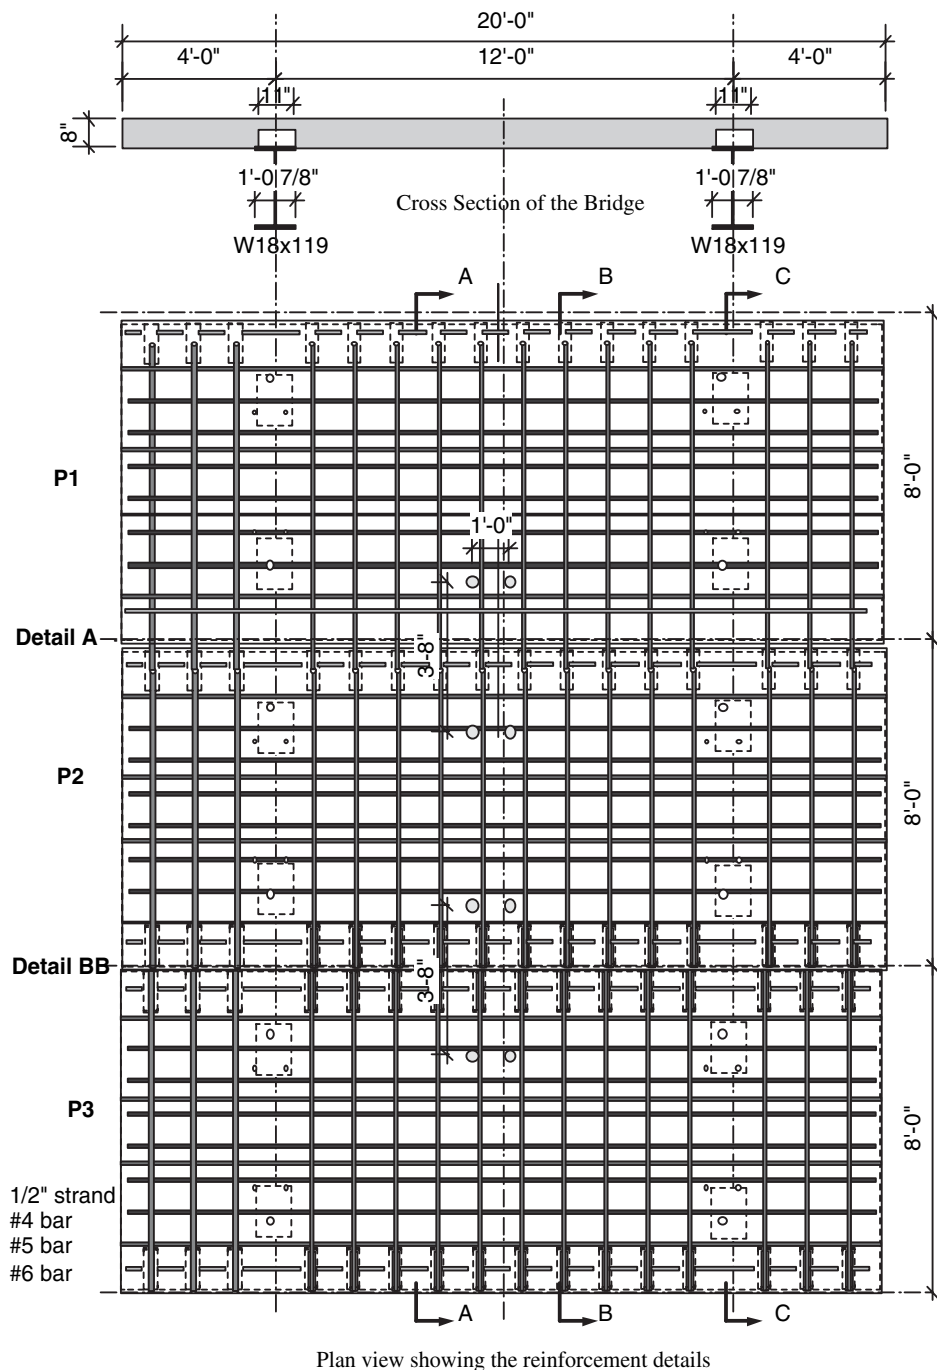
Cross section and plan view of the full-scale bridge specimen.
